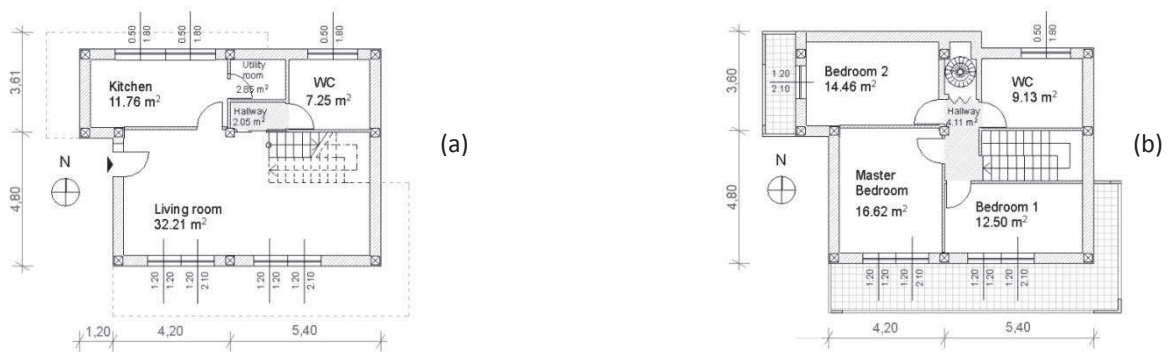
Ground floor (a) and first floor (b) of the detached house.
